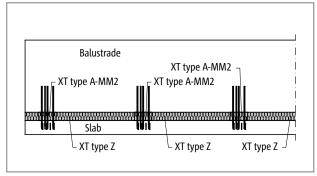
Schöck Isokorb® XT type A, Z: Parapet (XT type A-MM2)
